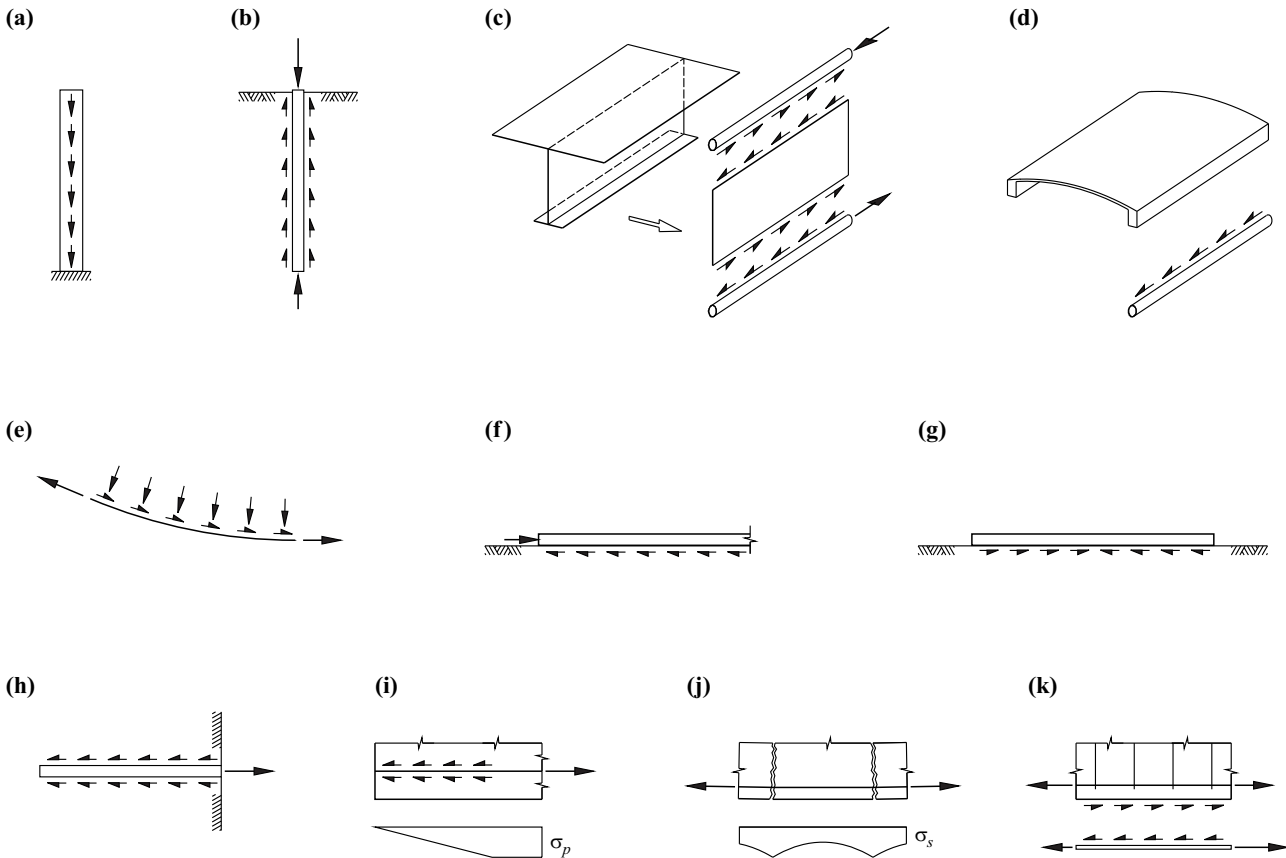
Bar extension – examples: (a) column, (b) pile, (c) beam flange (stringer), (d) shell edge beam, (e) loss of prestress due to friction, (f) friction on prestressed raft foundation, (g) rail subjected to thermal restraint, (h) pull-out test, (i) anchorage of pretensioned reinforcement in concrete, (j) tension stiffening in cracked reinforced concrete, (k) reinforced concrete beam strengthened with bonded laminate
